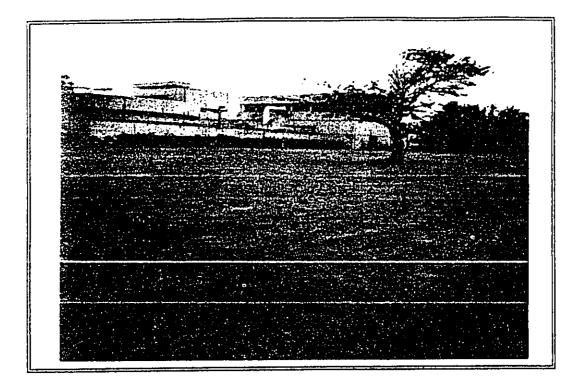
View of proposed Pretreatment Facility area looking south. Influent Screens Building is in the background.
